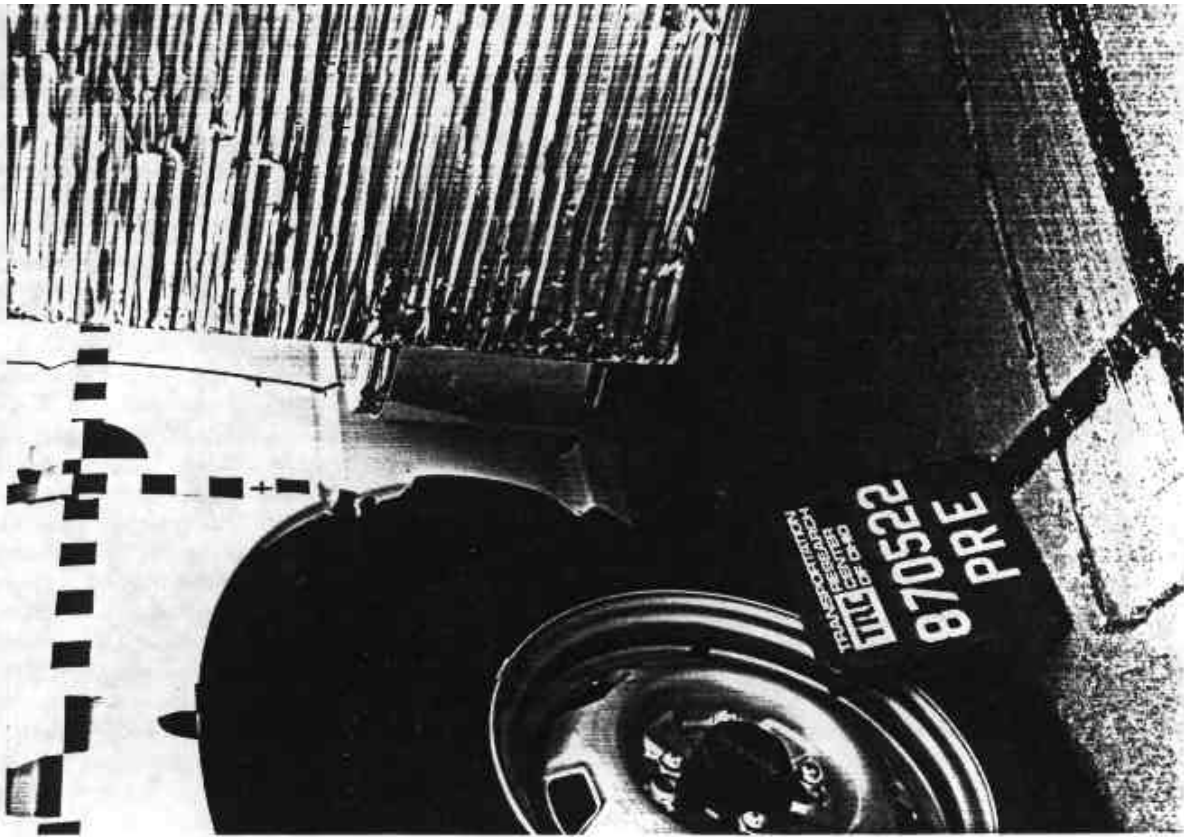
PRE-TEST CLOSE-UP - VIEW 1
